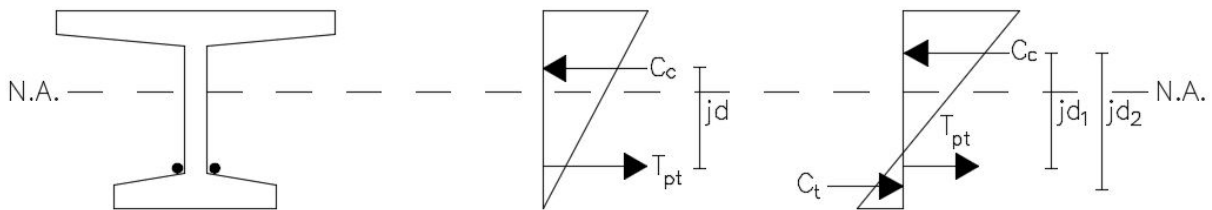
Internal Forces in Unbonded Girders from Decompression Moment to Cracking Moment (Stage 2)
